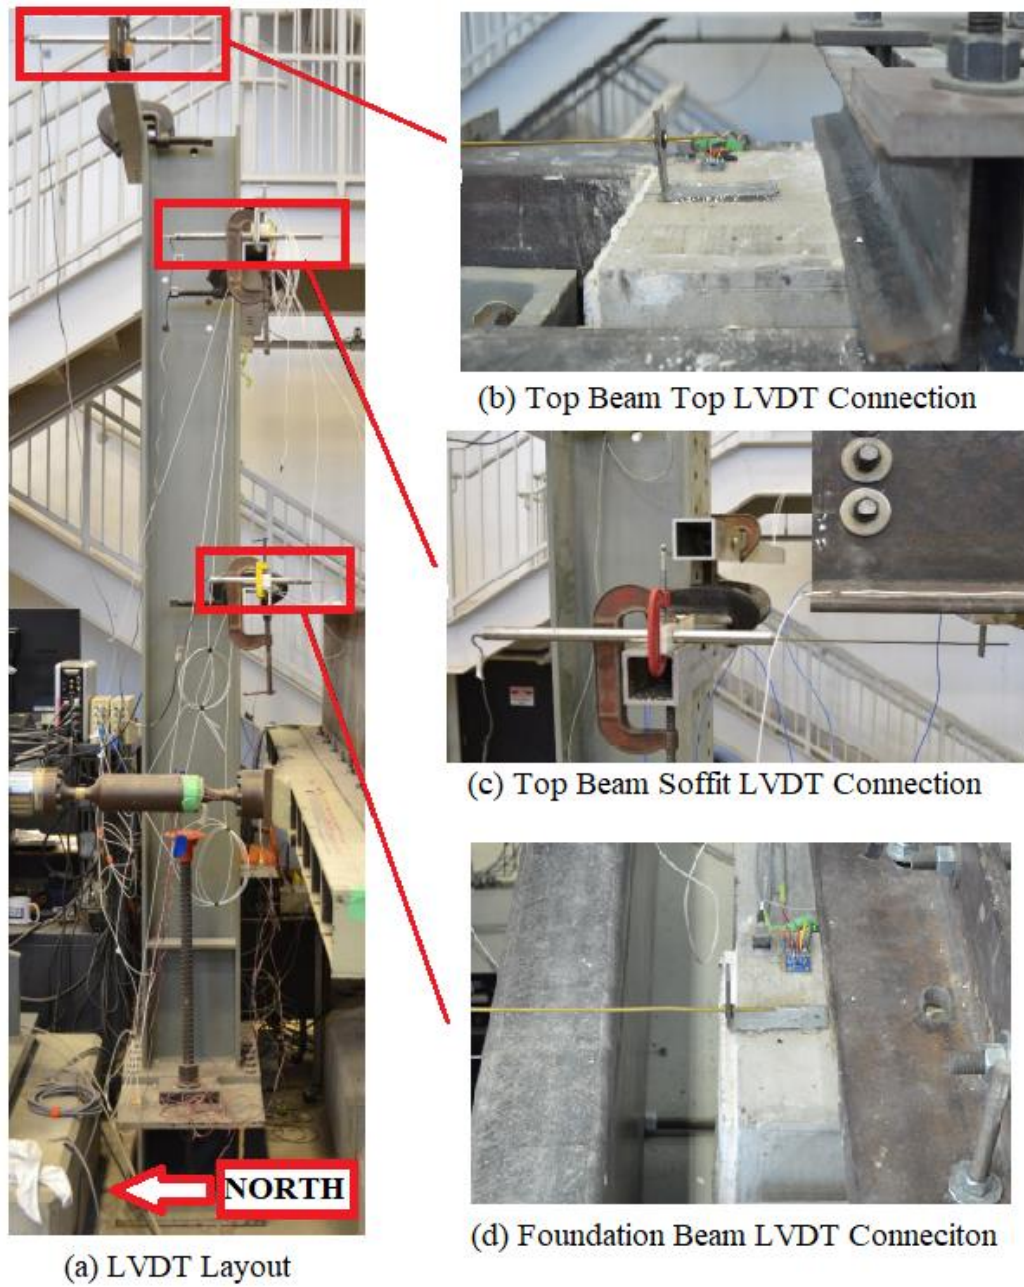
Frame In-Plane LVDTs Layout and Connections
